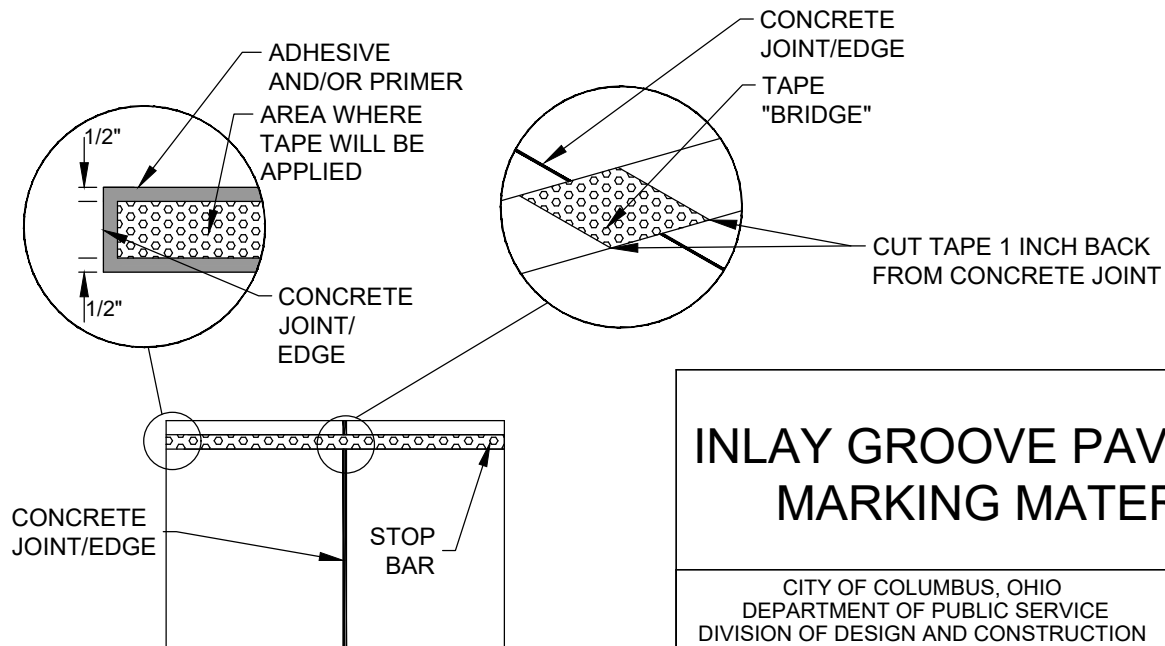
MARKING MATERIAL CROSSING CONCRETE JOINT
